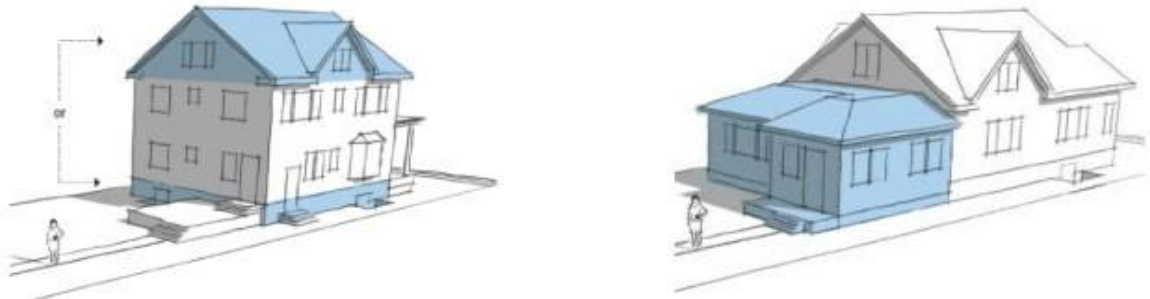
Examples of a Secondary Suite and an Attached Accessory Dwelling Unit (ADU).
